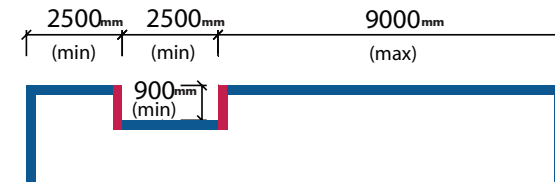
Examples of side walls facing street publicly accessible areas,
